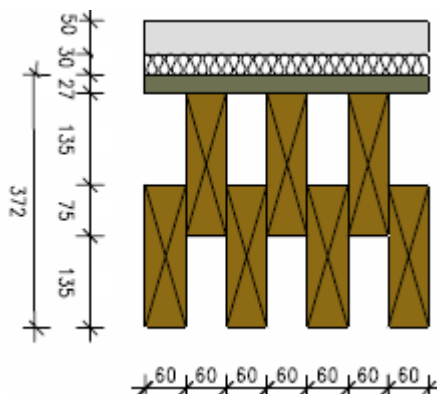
Cross-section of O'Portune® Floor with 50 mm Concrete Topping
